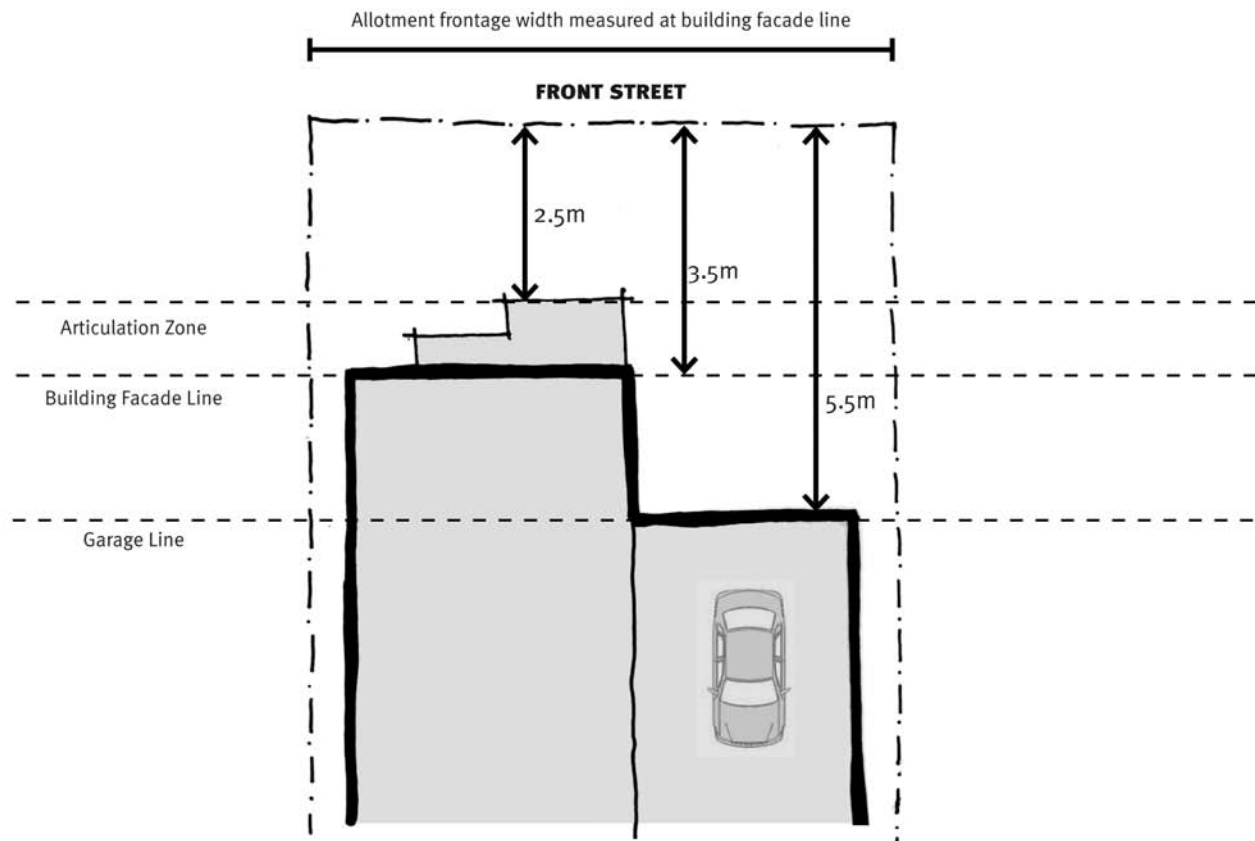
Minimum front setbacks for dwellings fronting open space or drainage land
